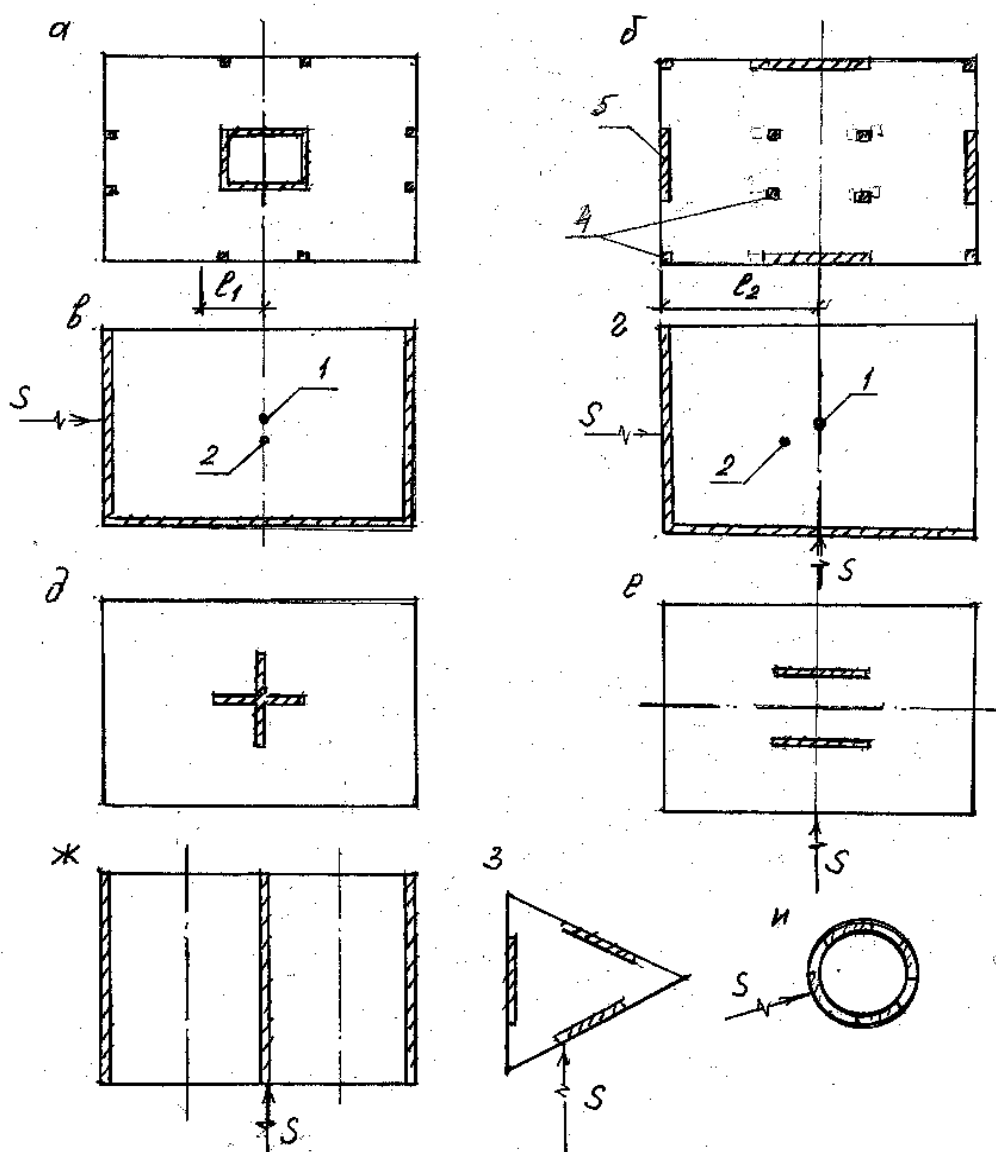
Examples of the location of load-bearing elements in the plan of buildings
